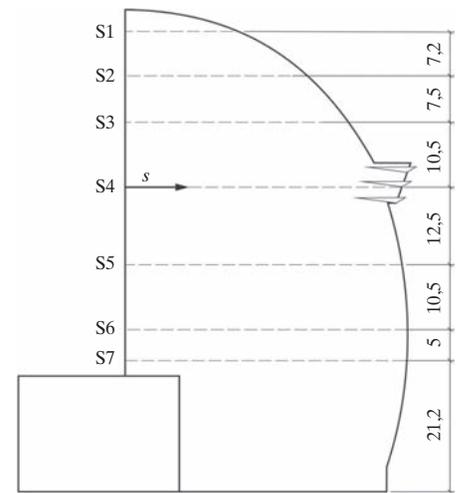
Instrumented cross sections, s is the horizontal distance of each cross section S1 to S7
